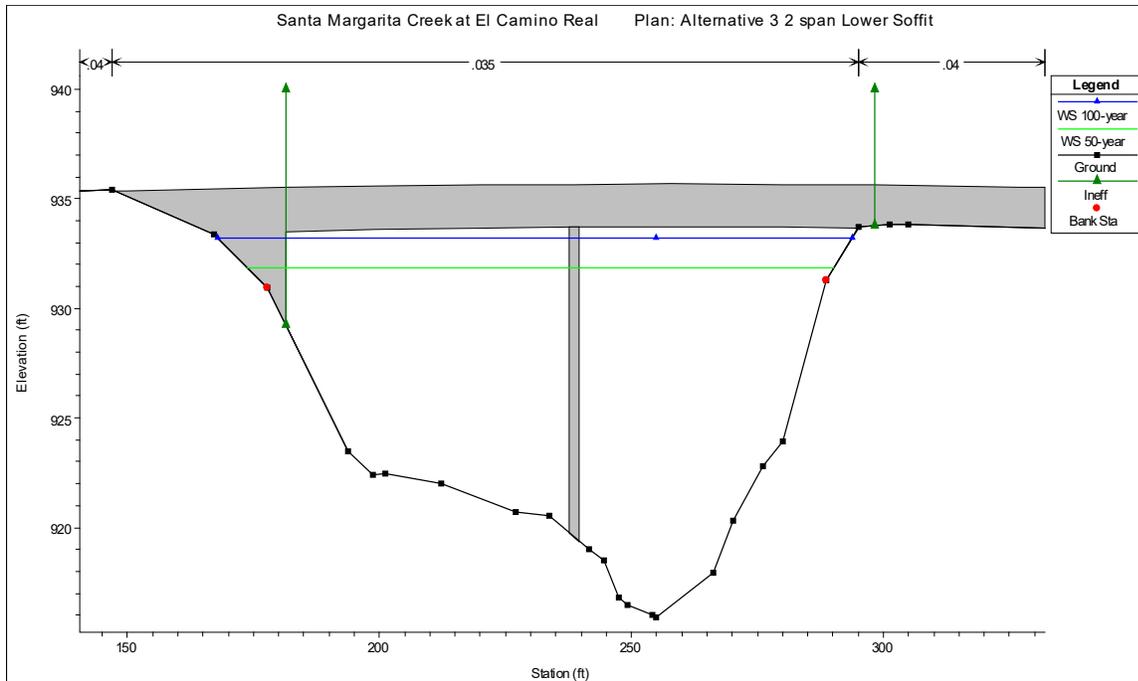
Alternative 3 – 119 ft, 2-span Bridge
